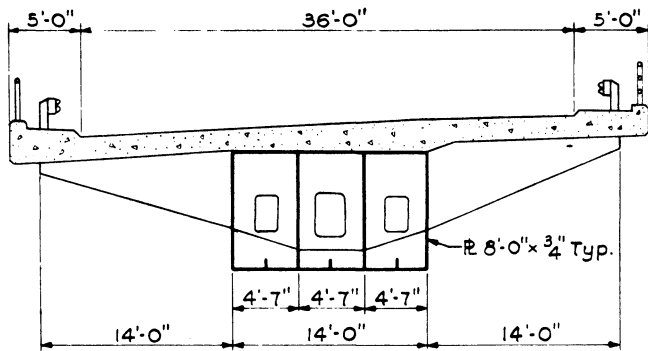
Fylde Junction Higher Bridge, Great Britain. Spans 7 @ 130 ft and 4 @ 97.5 ft. Three-cell box with cantilever arms supporting a reinforced concrete deck slab
